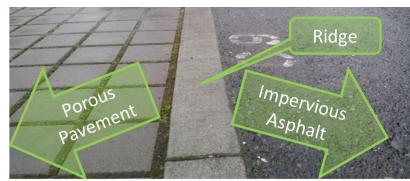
One way to achieve a hydraulically isolated pavement.
